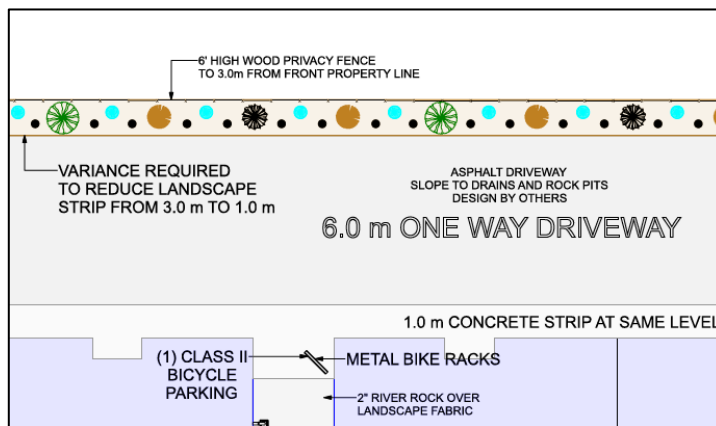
Excerpt of plans showing reduced landscape buffer (north)
